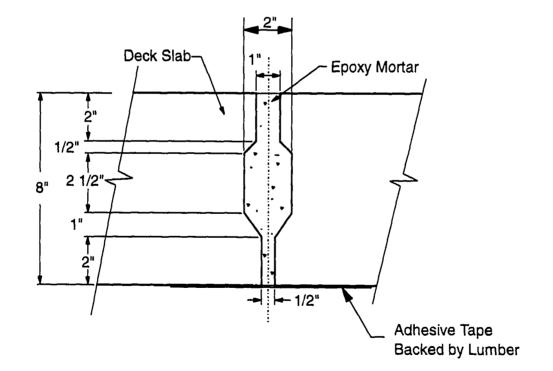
Joint between precast slabs, New York Thruway Authority.
